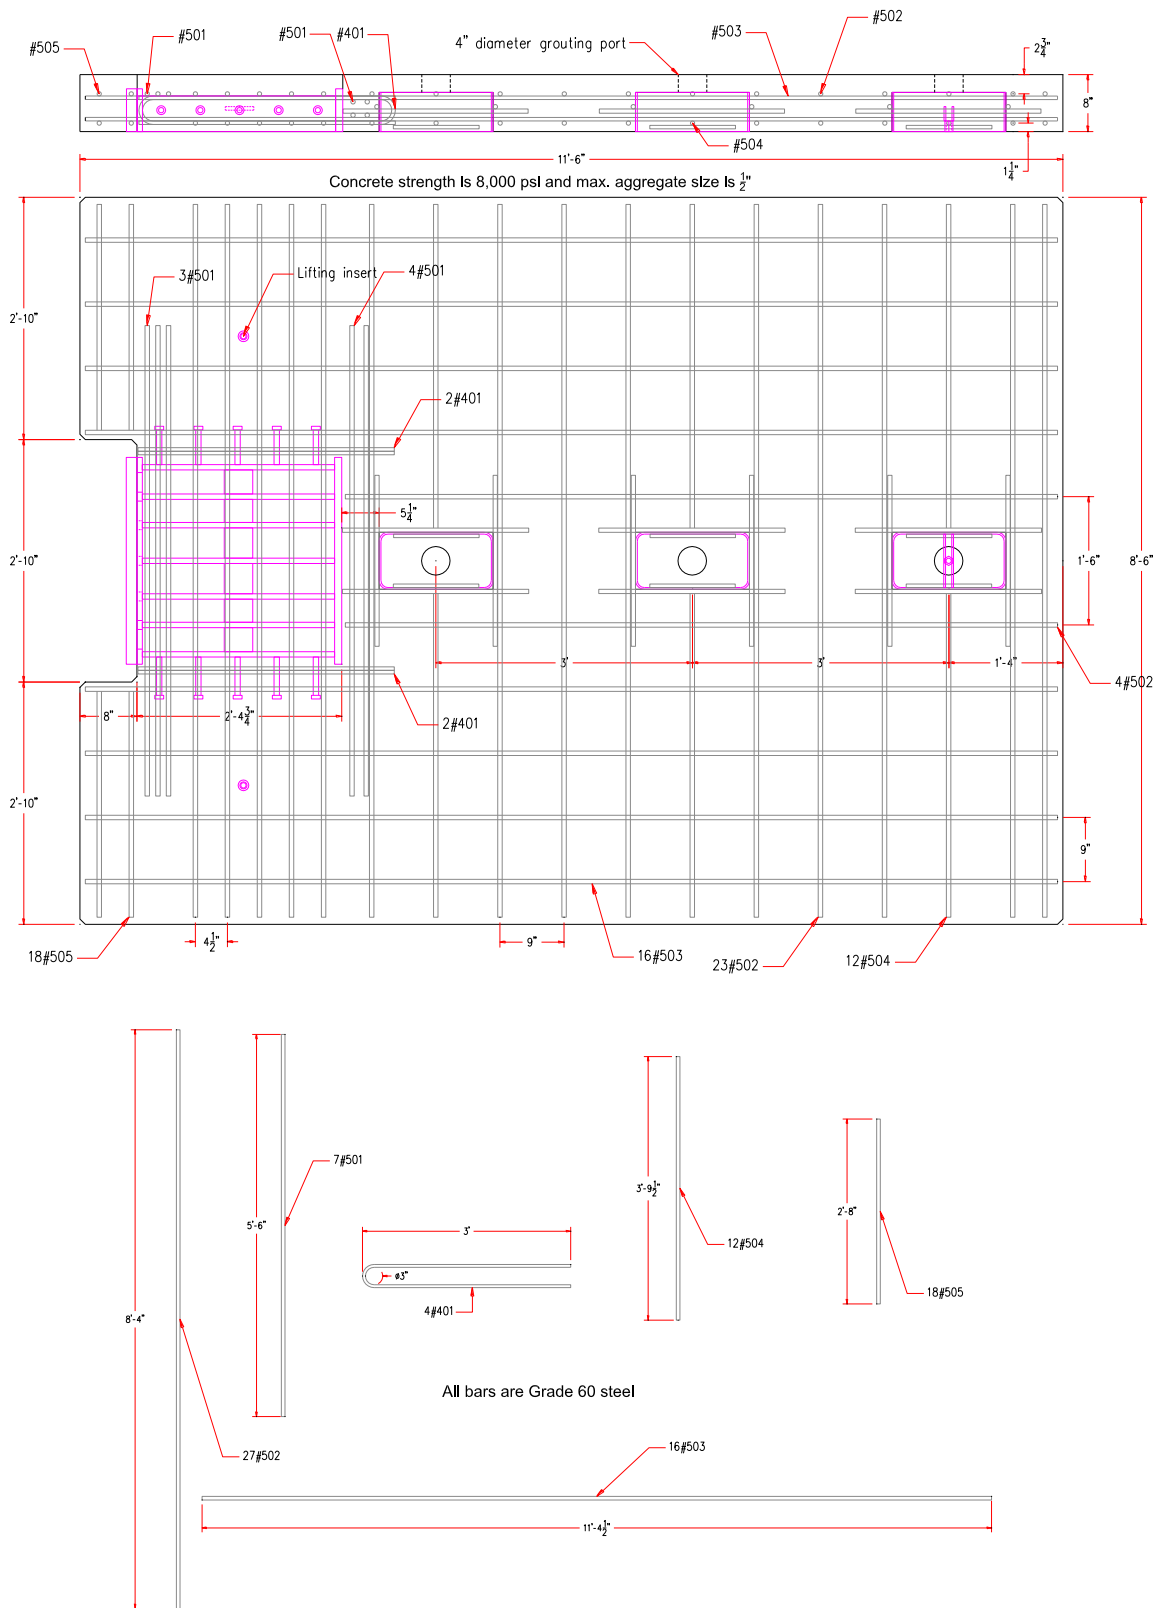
Dimensions and reinforcement of the end panel specimen
